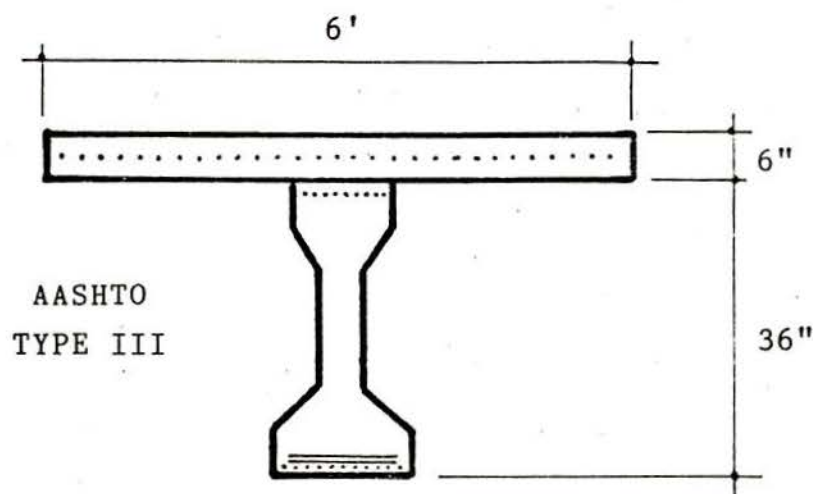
Layout and reinforcement arrangement for both prestressed concrete composite beams.
